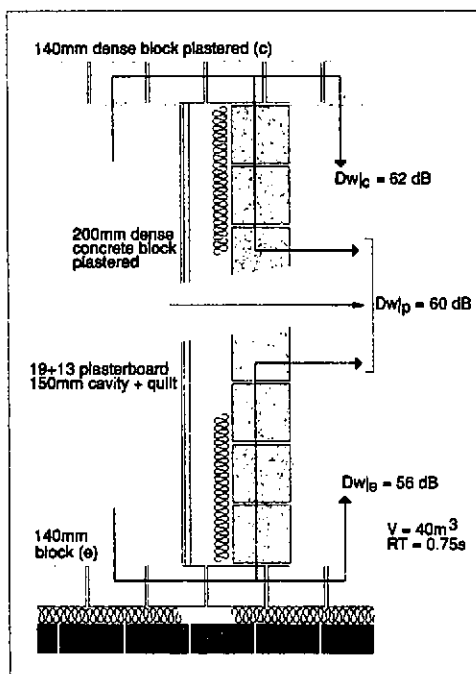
Plan, party wall between Teaching Rooms, showing D_w for masonry wall radiation obtained from normal velocity measurements
